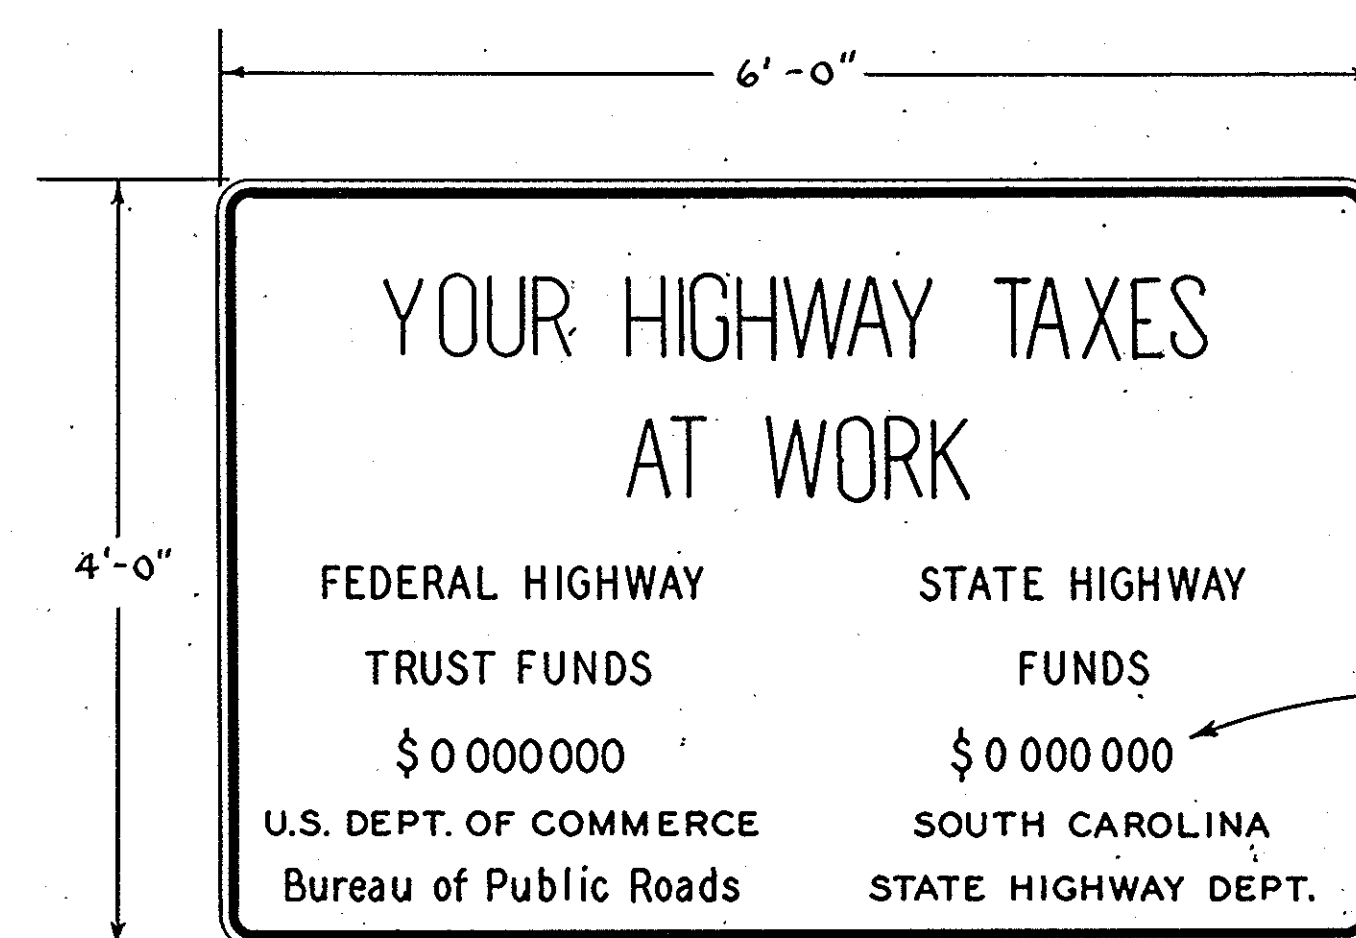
DETAILS SHOWING STANDARD SIGNS, BARRIERS, LIGHTS, AND BARRICADES TO BE FURNISHED, ERECTED, AND MAINTAINED BY THE CONTRACTOR WHERE APPLICABLE ON ALL ROAD OR BRIDGE CONTRACTS
